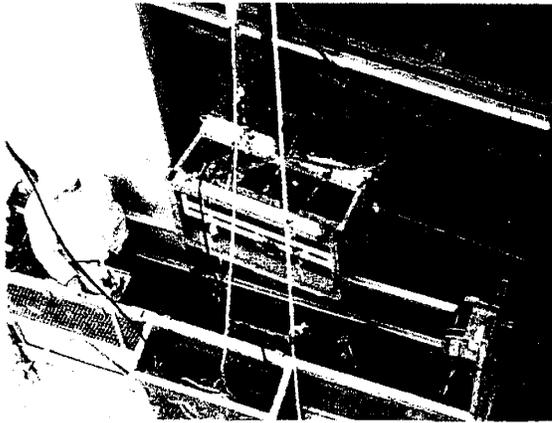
East elevation, near south end of head of vision glass at Floor 21. Differential pressure water test chamber installed.
